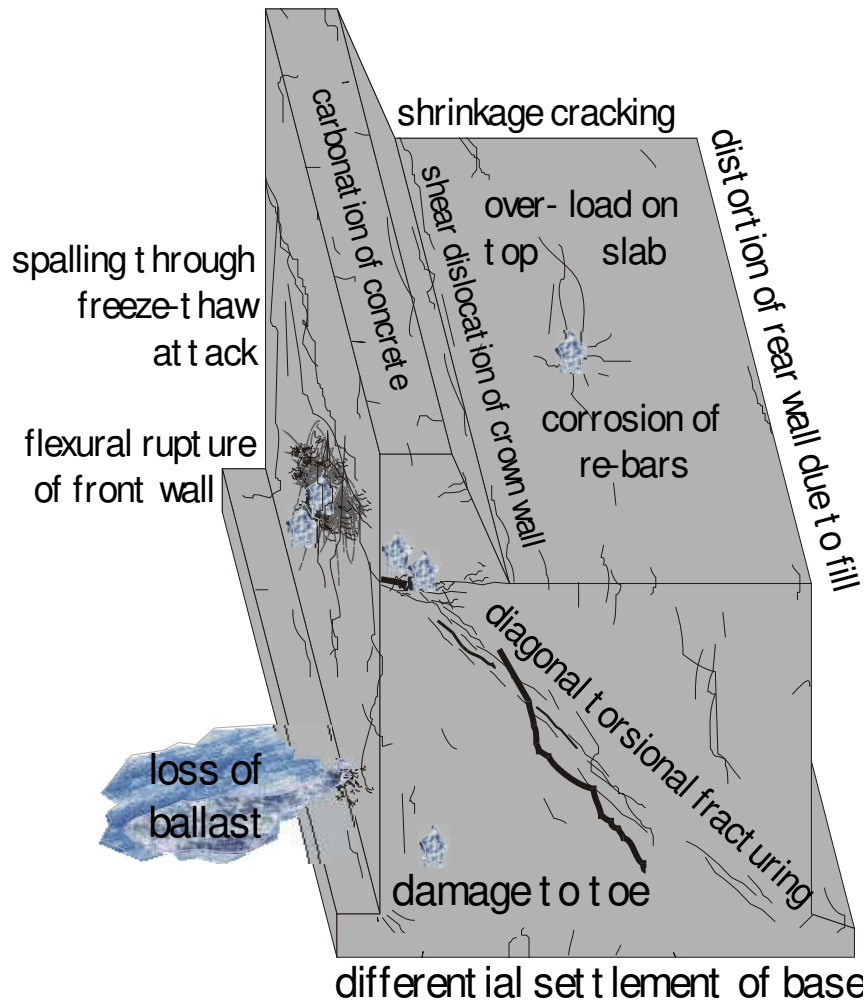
Sketch of some possible damaging mechanisms in a reinforced concrete caisson.
